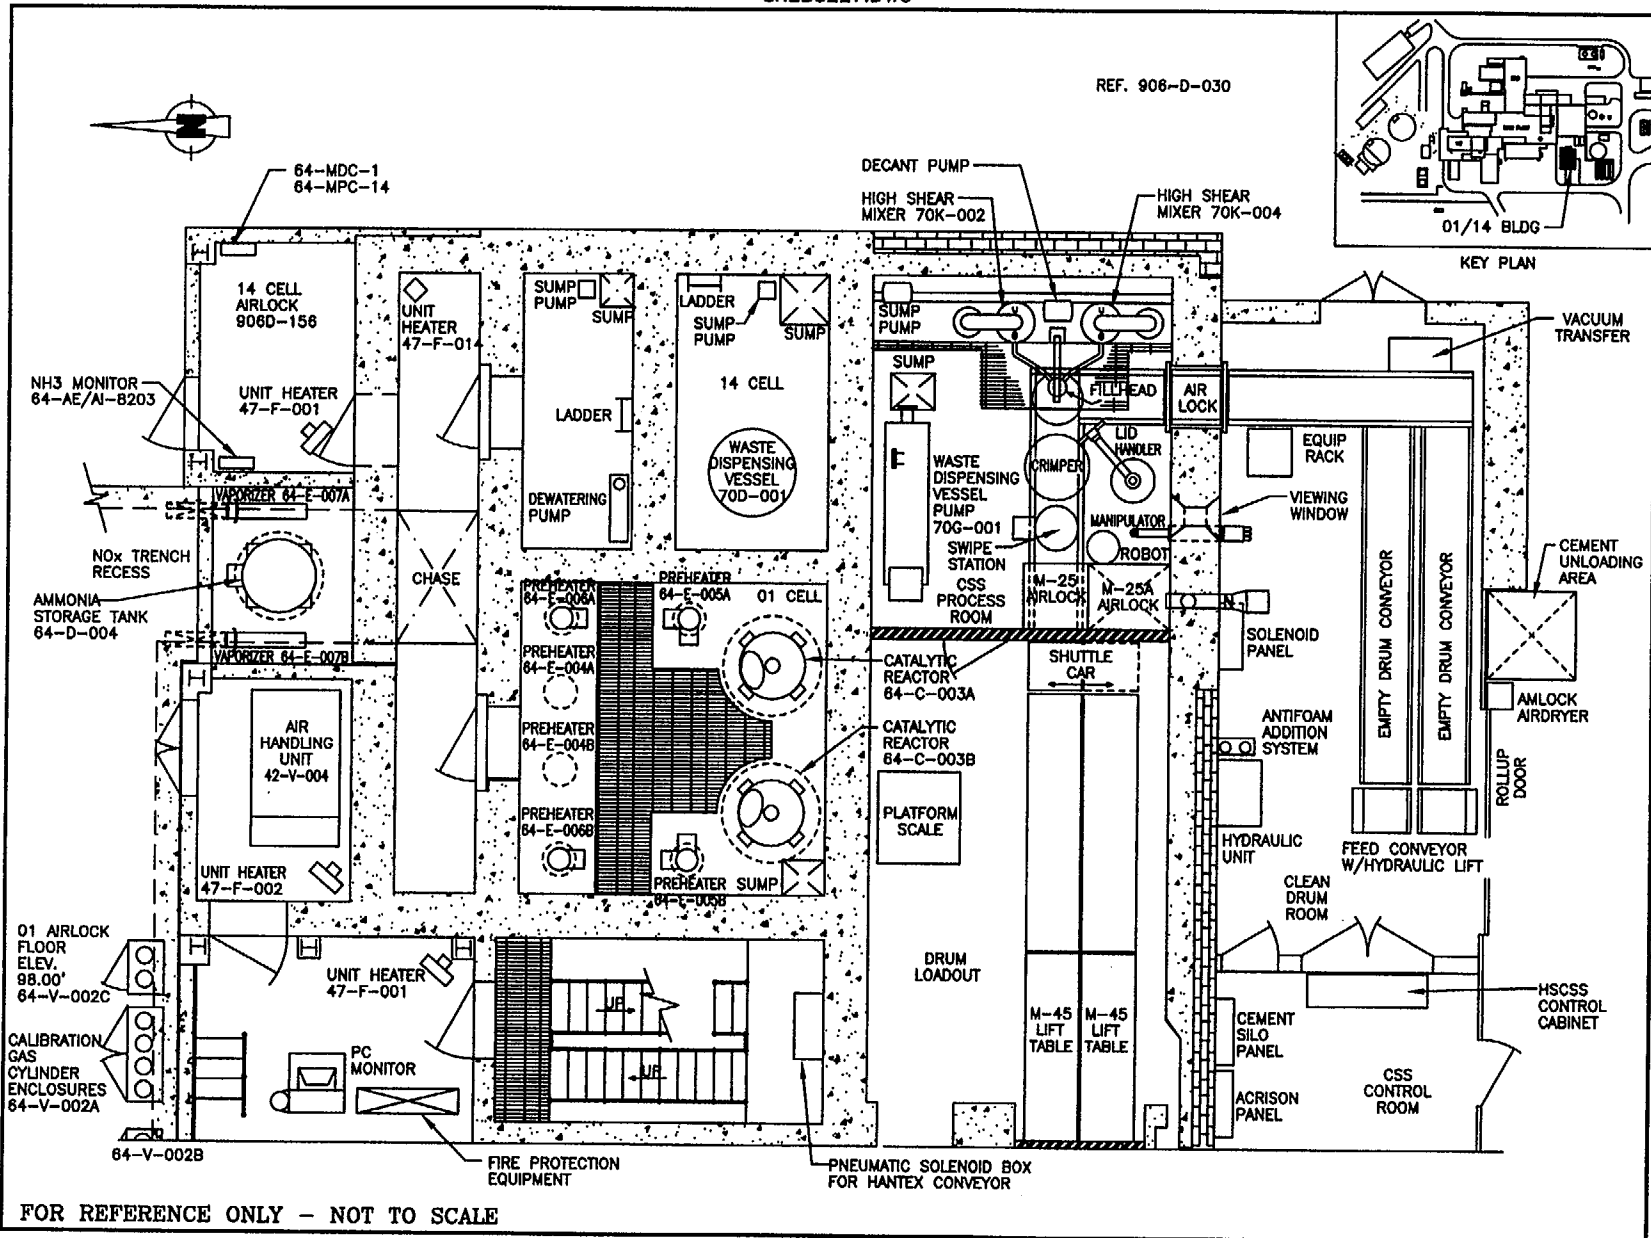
General Arrangement - 01/14 Building Plan Elevation 98.0'
